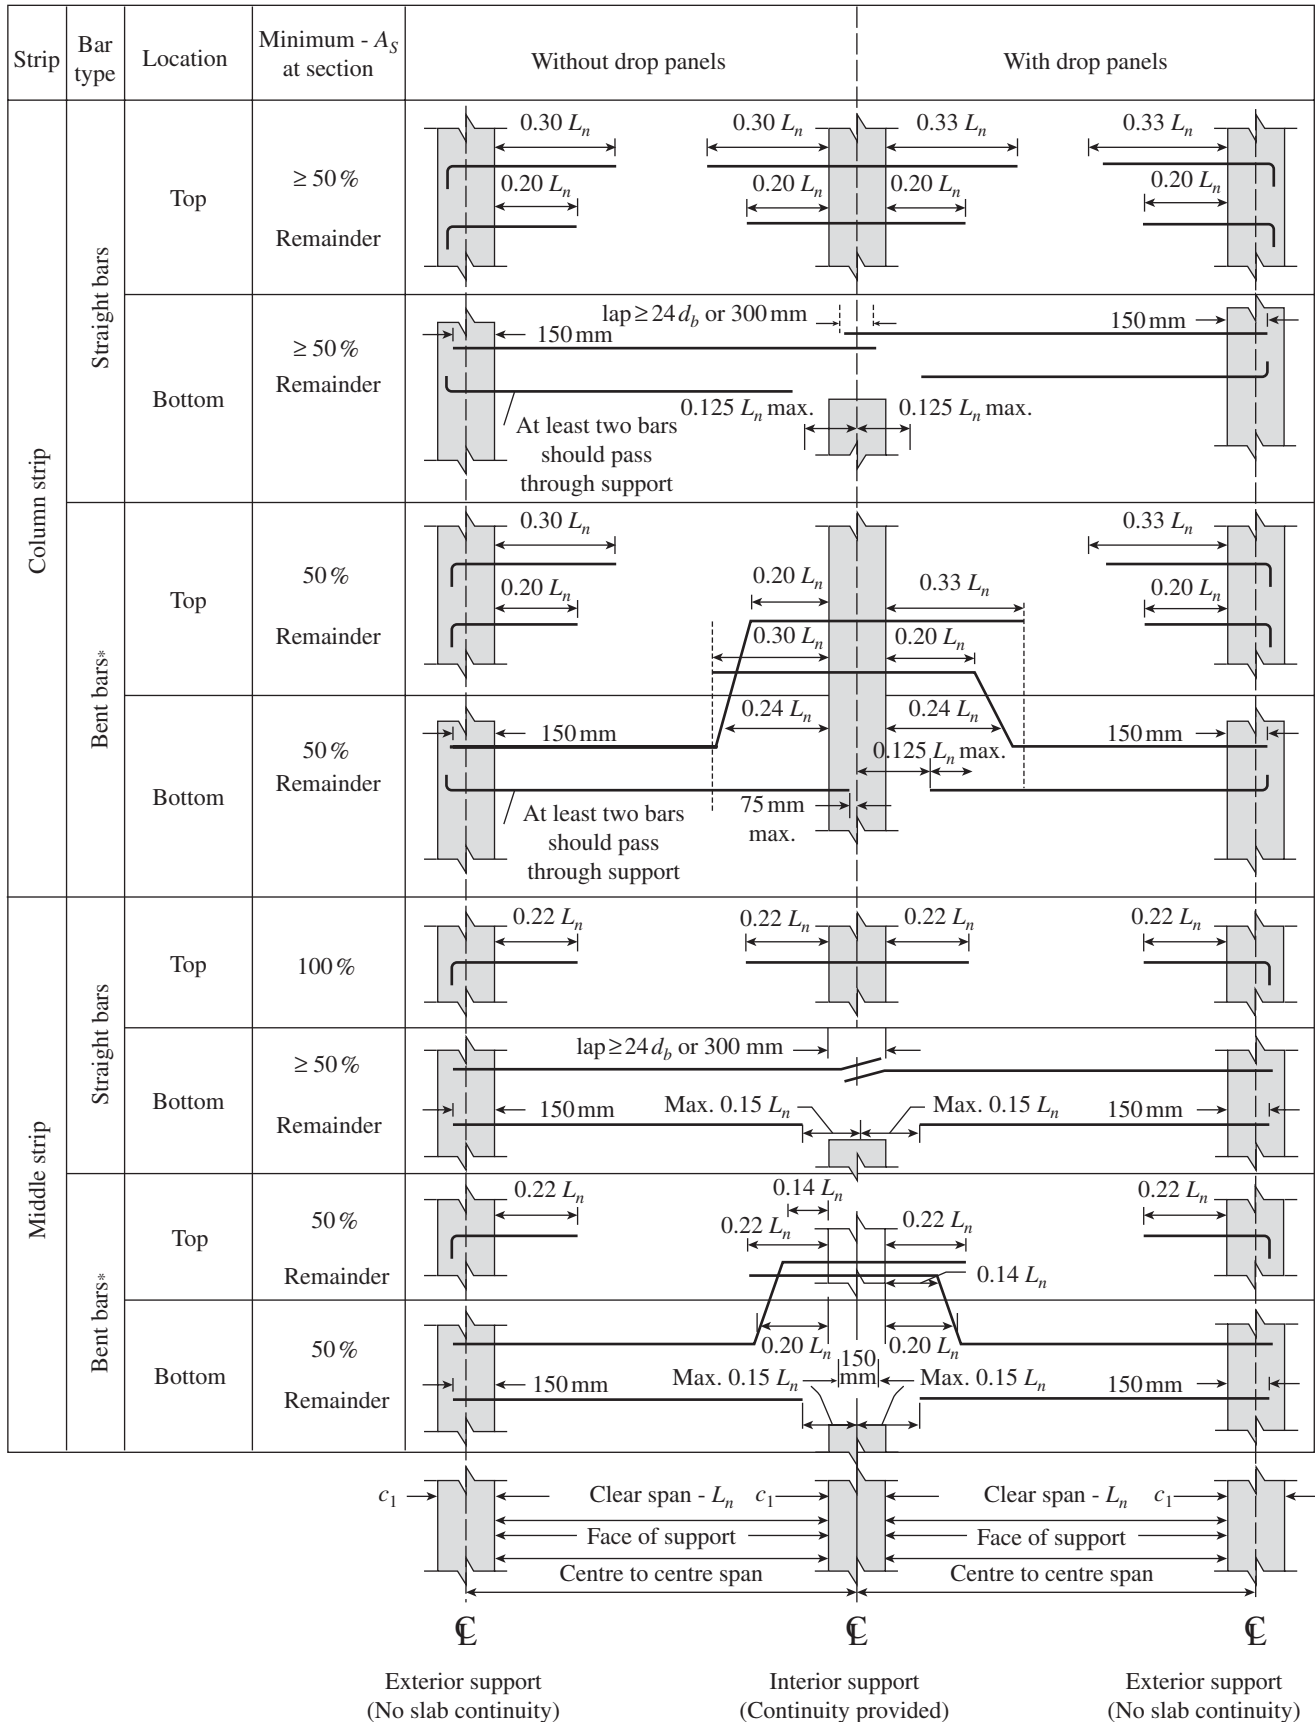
Minimum extensions and bend joint locations for reinforcement in flat slabs
